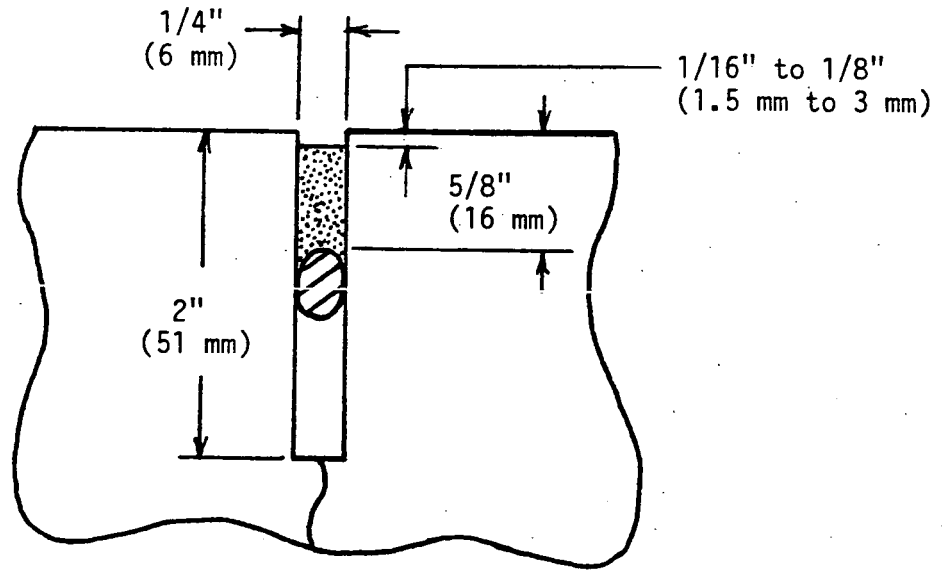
1/4-Inch (6 mm) Longitudinal Joint and Skewed Contraction Joint Detail
